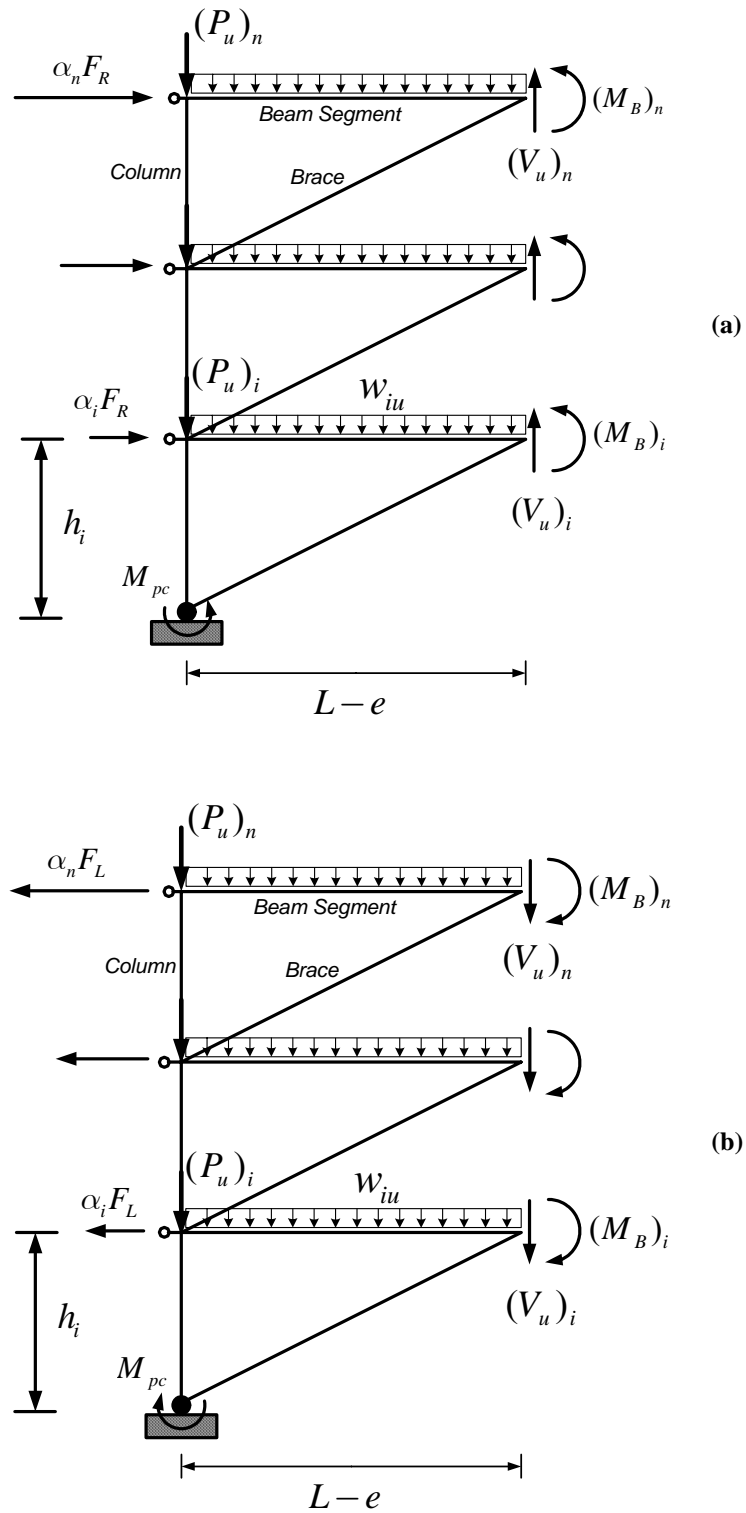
Free body diagram of interior column 2 and associated beam segments and braces: (a) lateral forces acting toward right; (b) lateral force acting toward left
